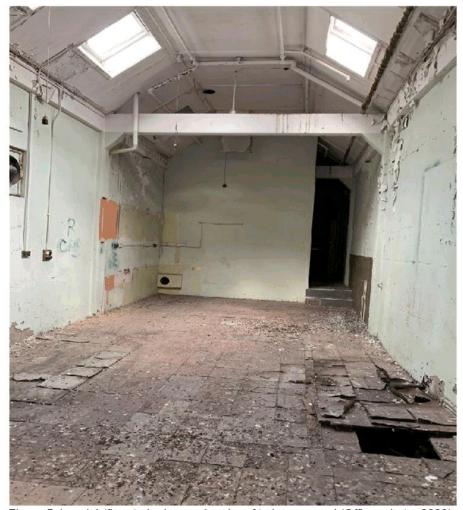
Level 4 (floor to be lowered and roof to be removed (Officer photo, 2020)
